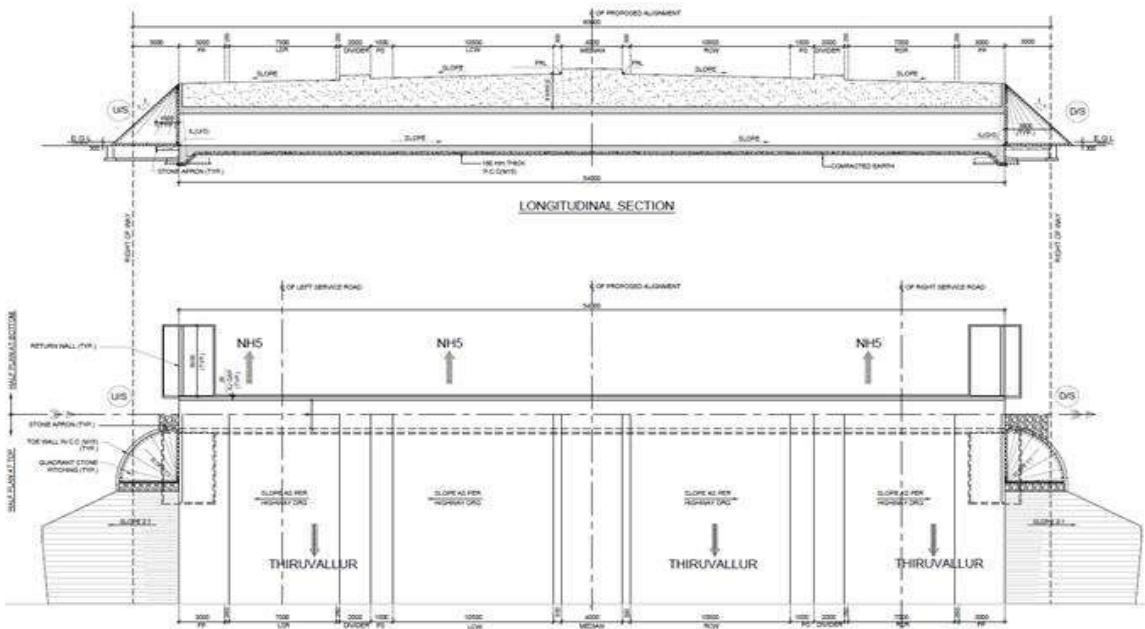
CD Structure (Box Culvert) Proposed at km 34/133
